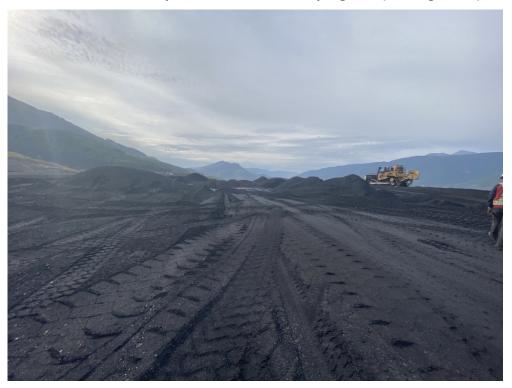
CCR Dump diversion ditch and Lindsay Drain extension. (looking west)
